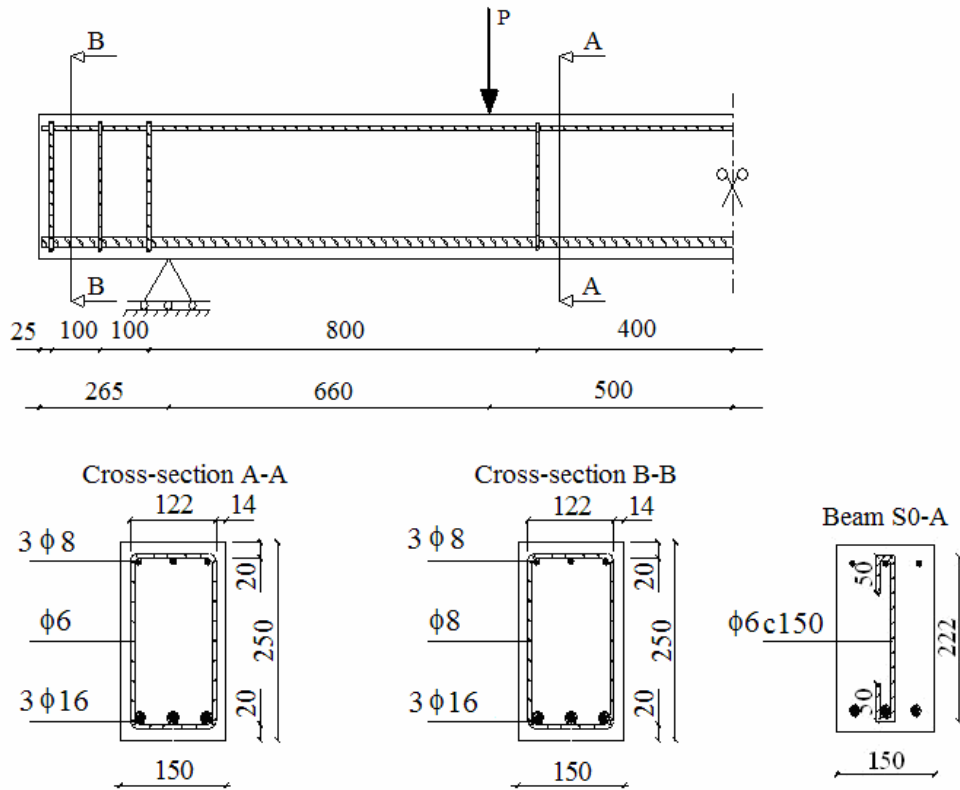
Geometry and reinforcement layout of beams designed shear failure. Beam S0-A had additional stirrups in the shear zone, as illustrated.
